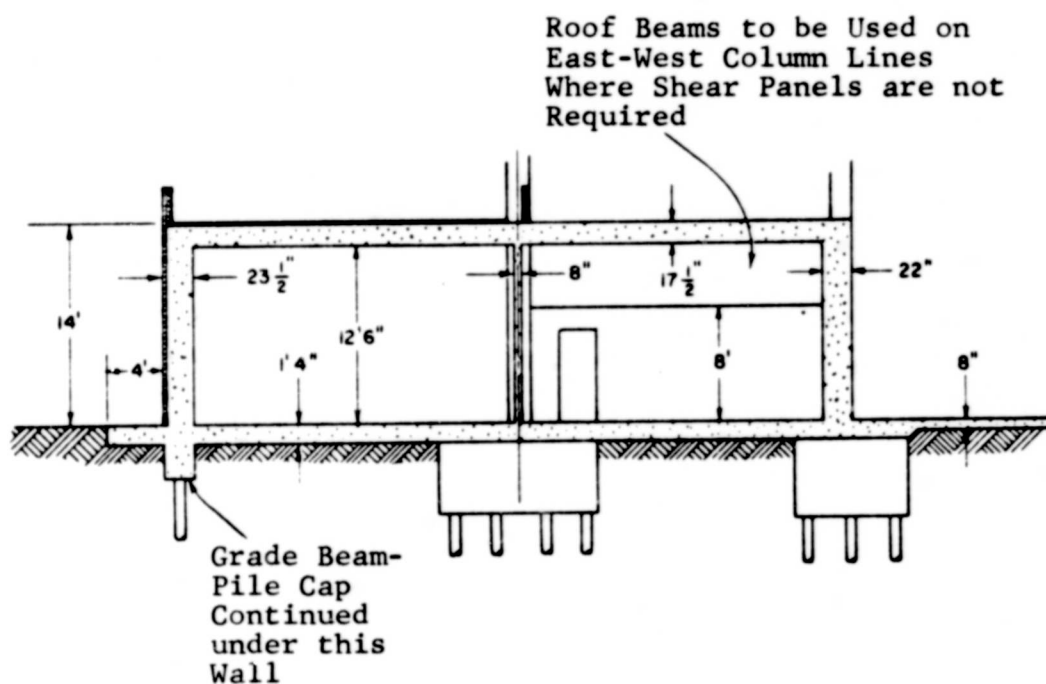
CROSS SECTION THROUGH THE PROPOSED
